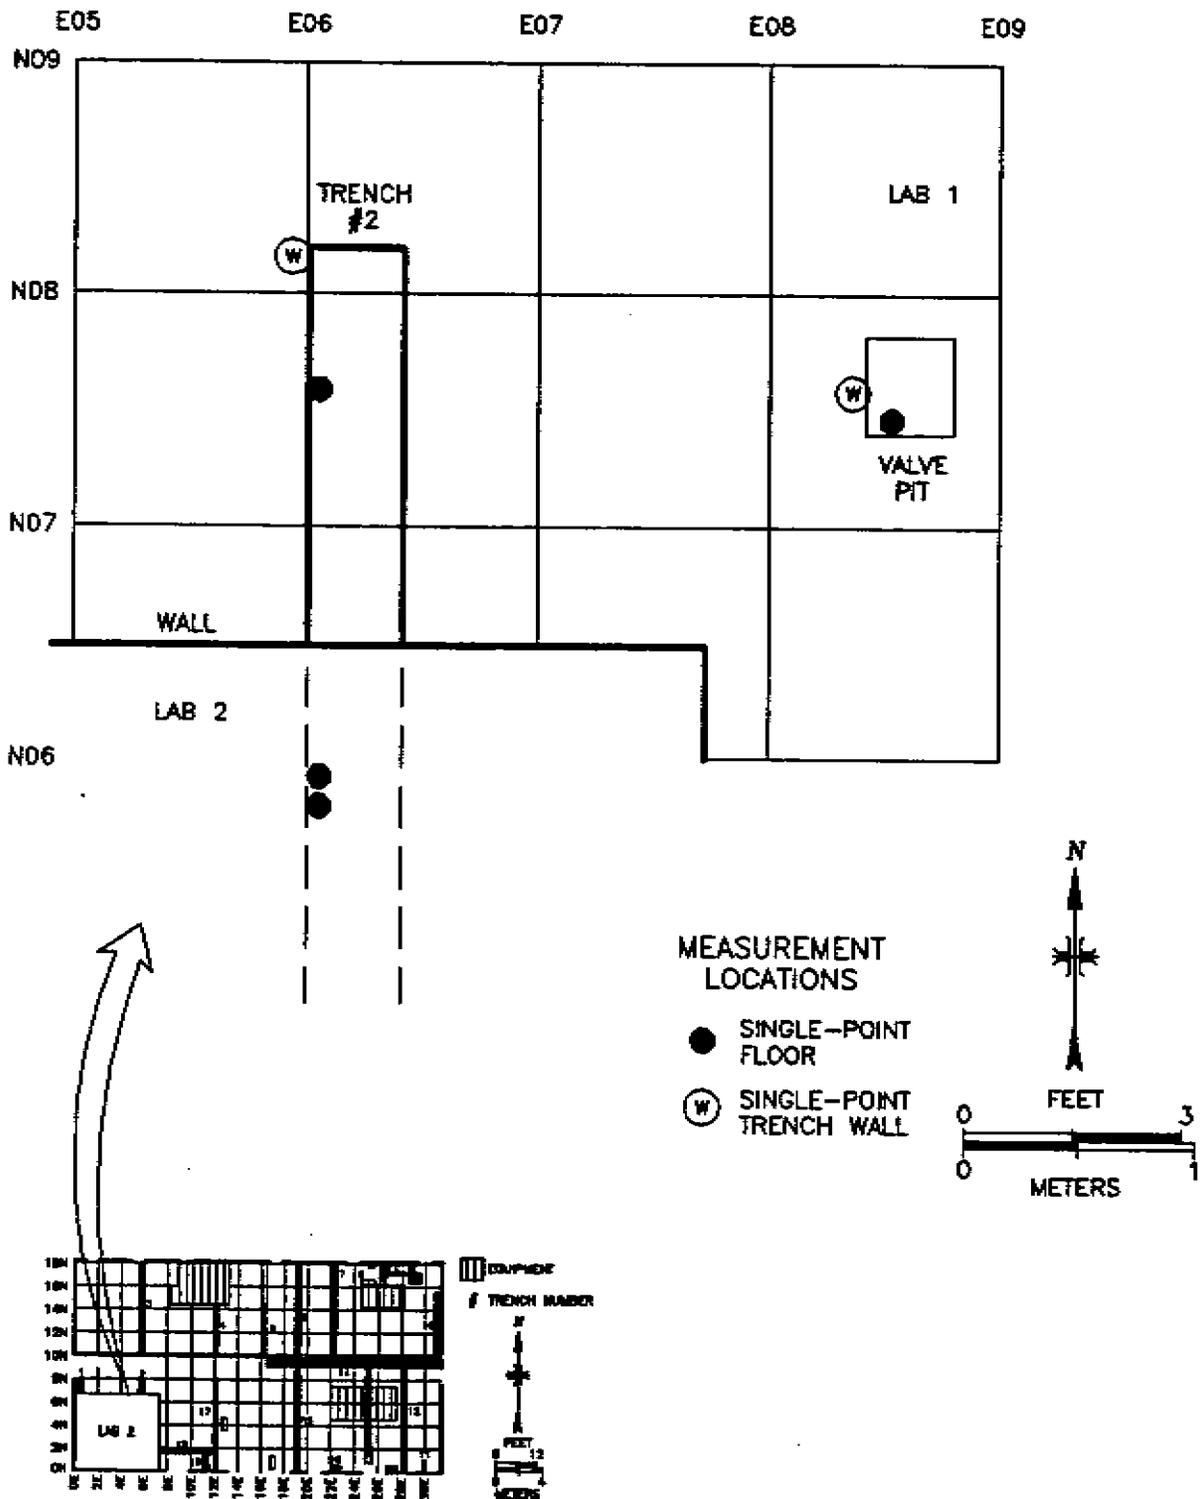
Building 23, Lab 1, Trench 2 and Valve Pit, Indicating Measurement Locations
